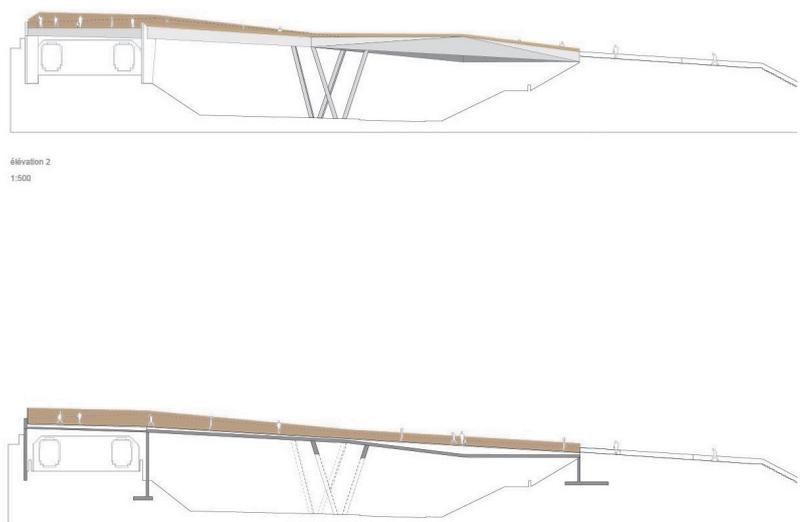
2b Architectes. 2015. La Sallaz Footbridge.
